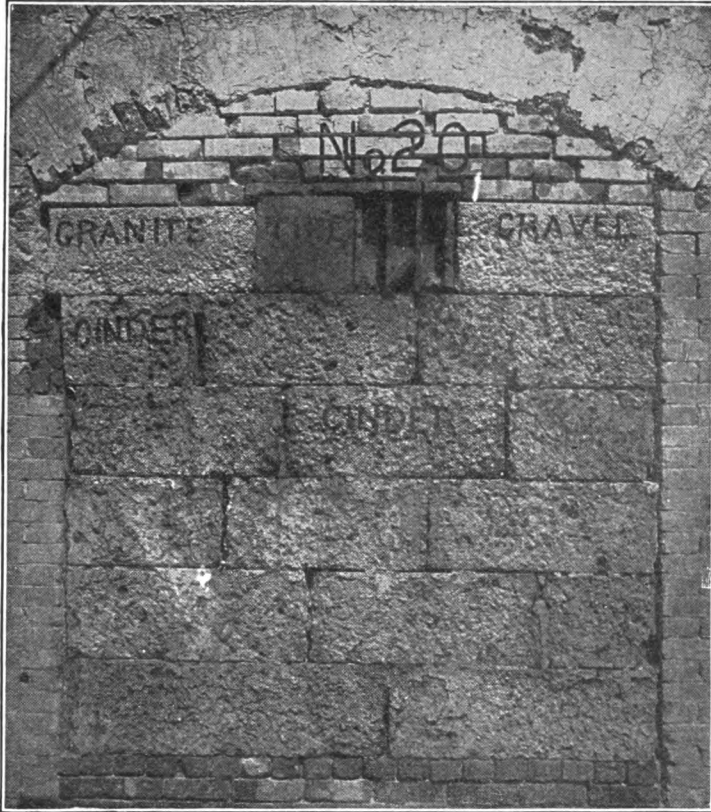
Appearance After Test of Panel Containing Cinder-Concrete Beams
